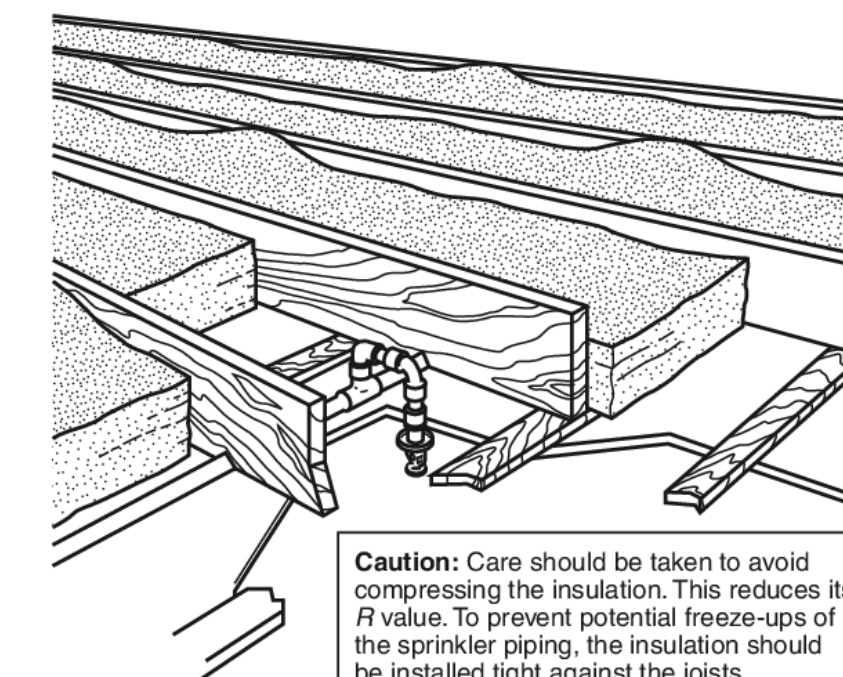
(e) Insulation Recommendations - Arrangement 5.
